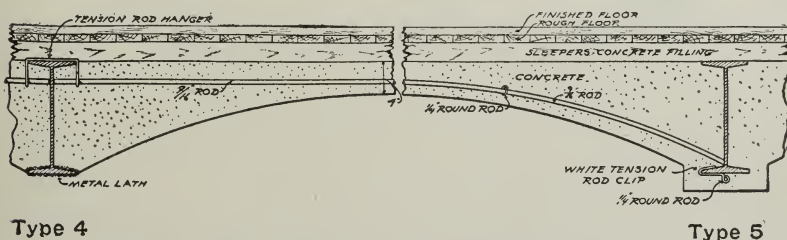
e. White Concrete Segmental Floor Arch, System F.
